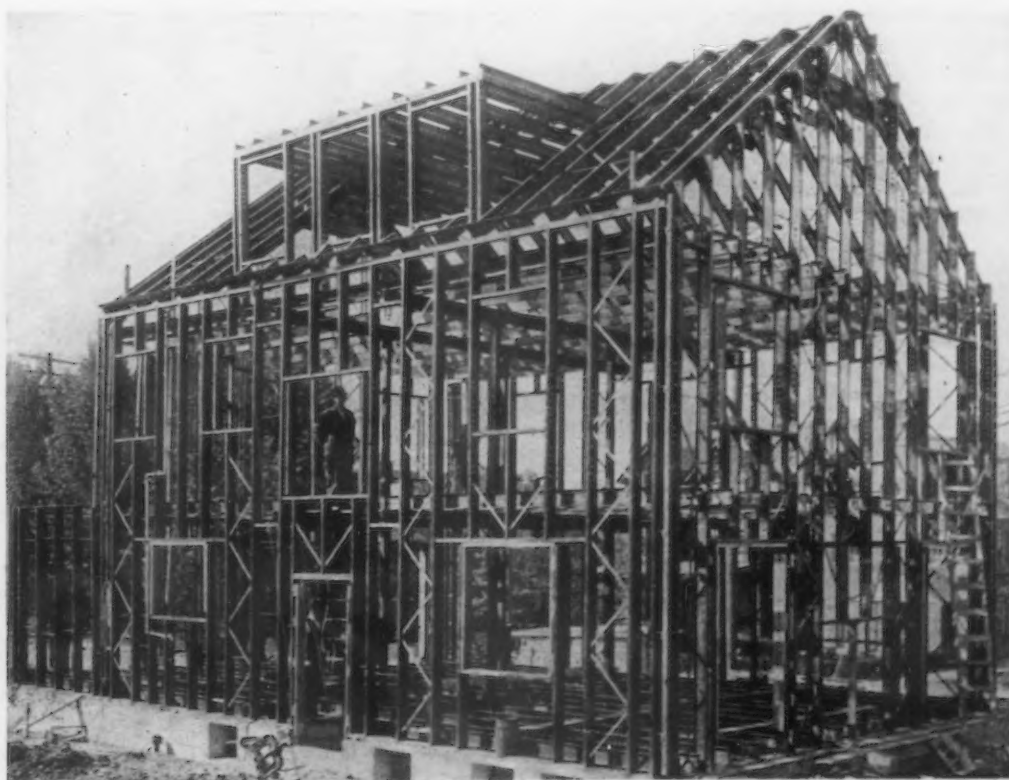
Steel frame house at Forest Hills, Long Island, as developed by Robert Tappan. This shows much wider stud spacing than the house in Fig. 8, giving effect to the great strength of steel.
